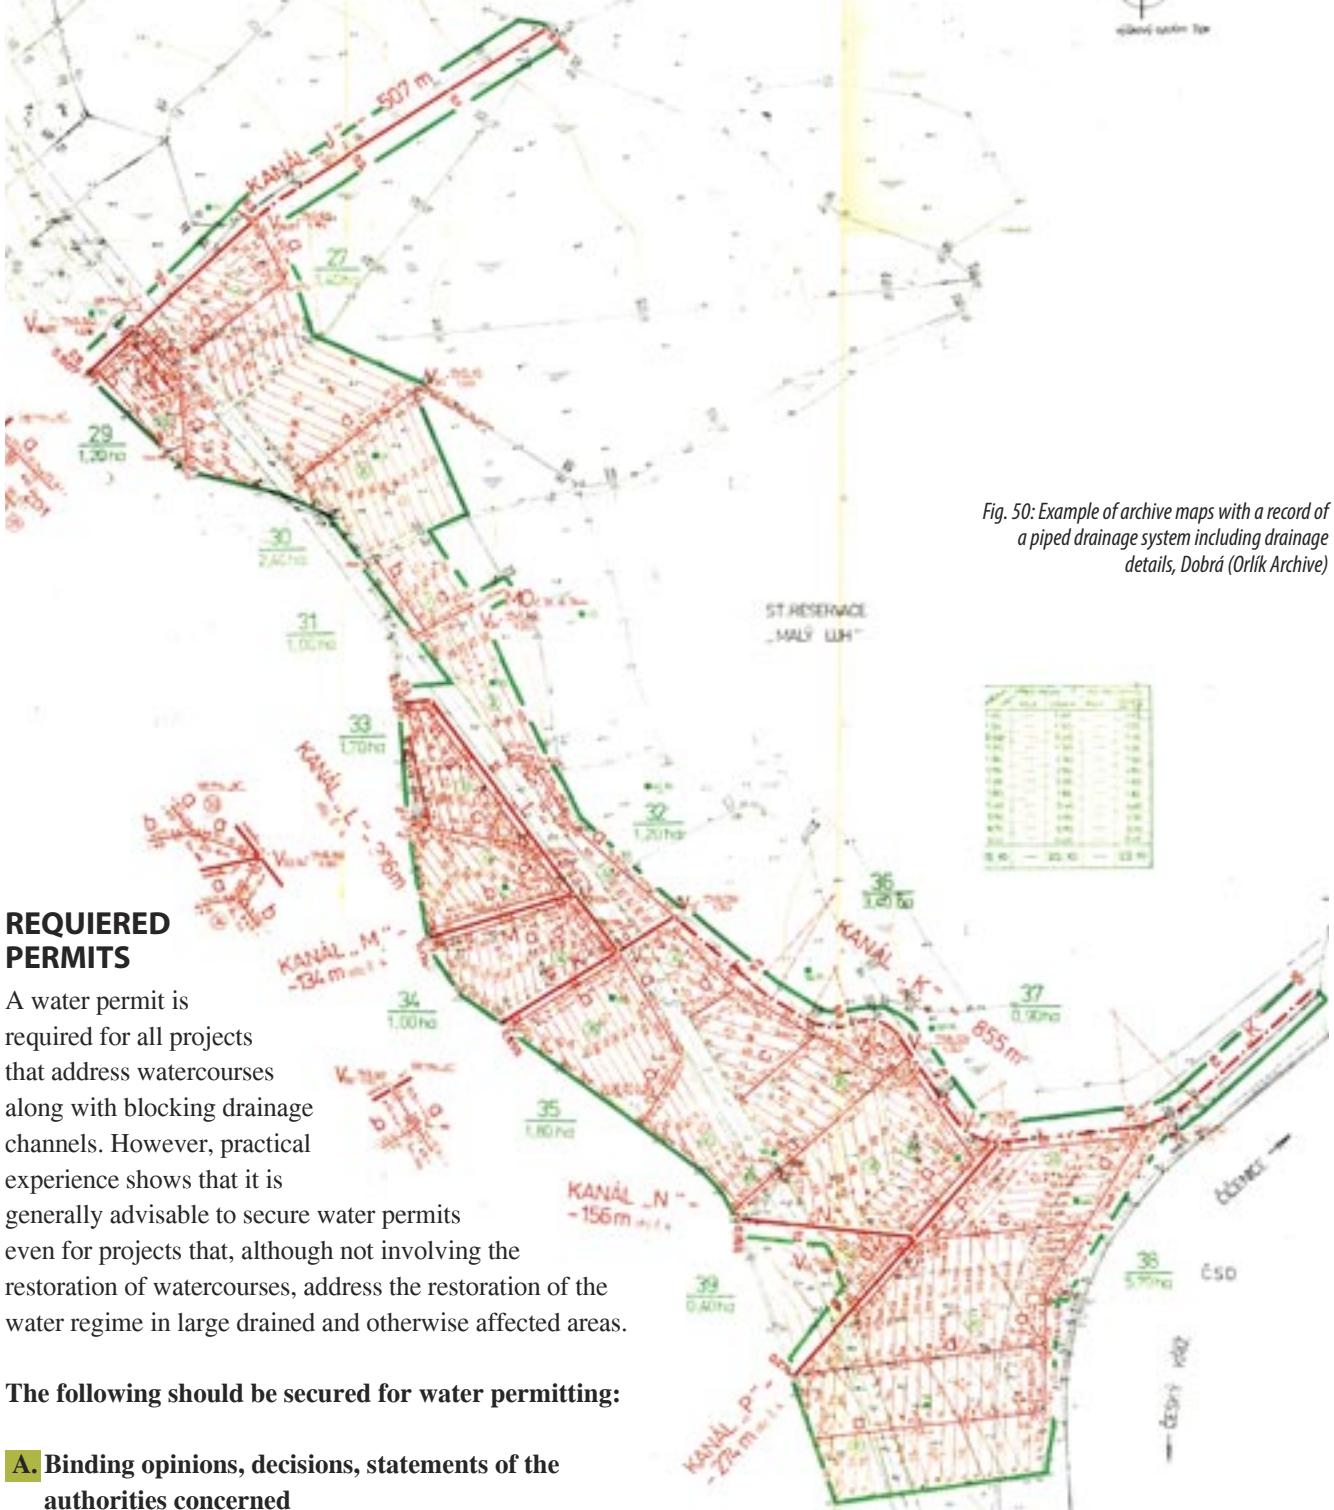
Example of archive maps with a record of a piped drainage system including drainage details, Dobrá (Orlik Archive)
